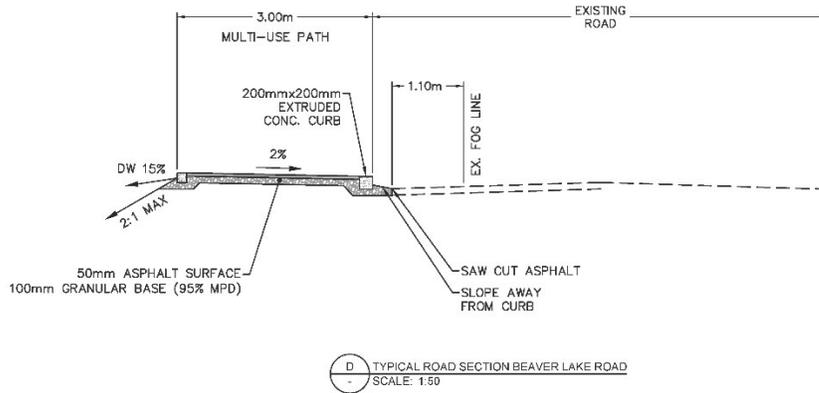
Typical Road Section showing proposed Beaver Lake Road improvements
